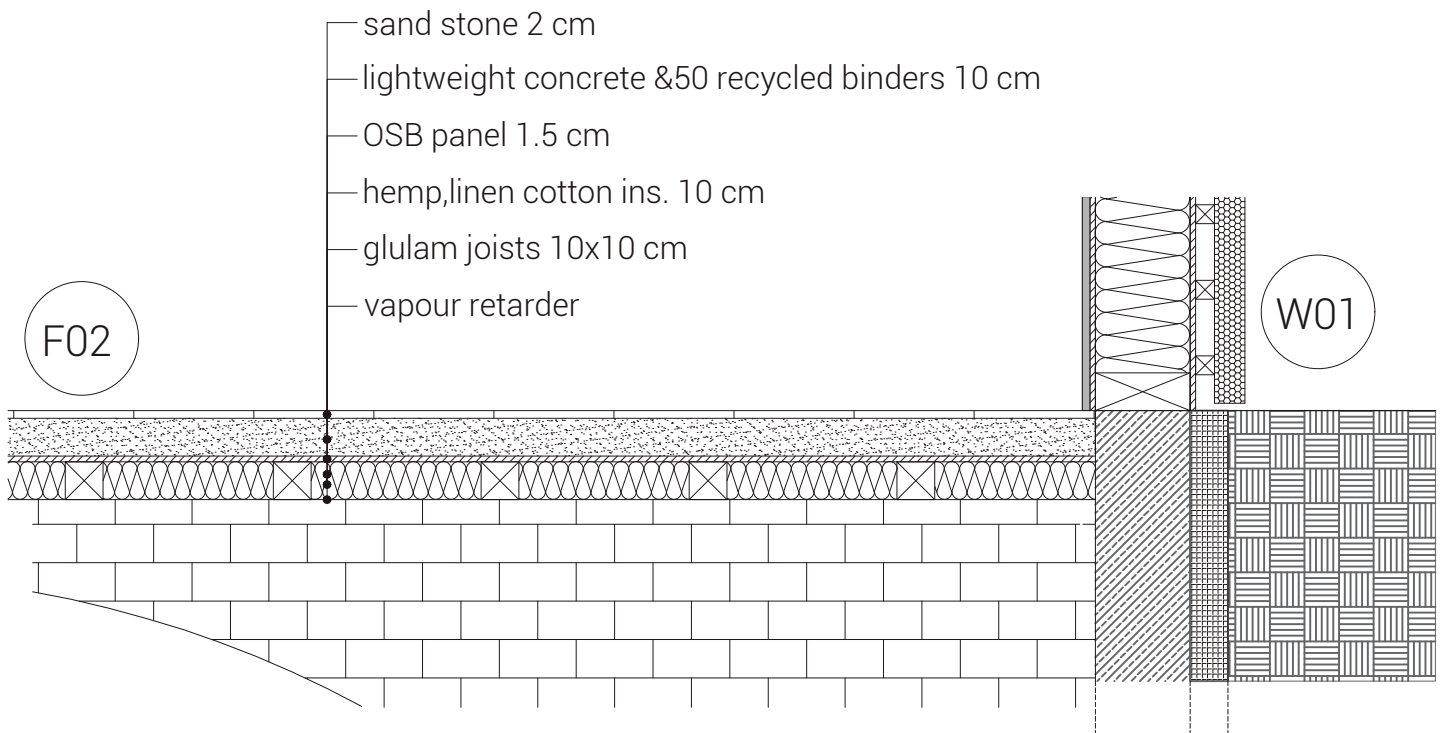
OPTIMIZATION FOUNDATION / GROUND FLOOR SLAB (F02)
